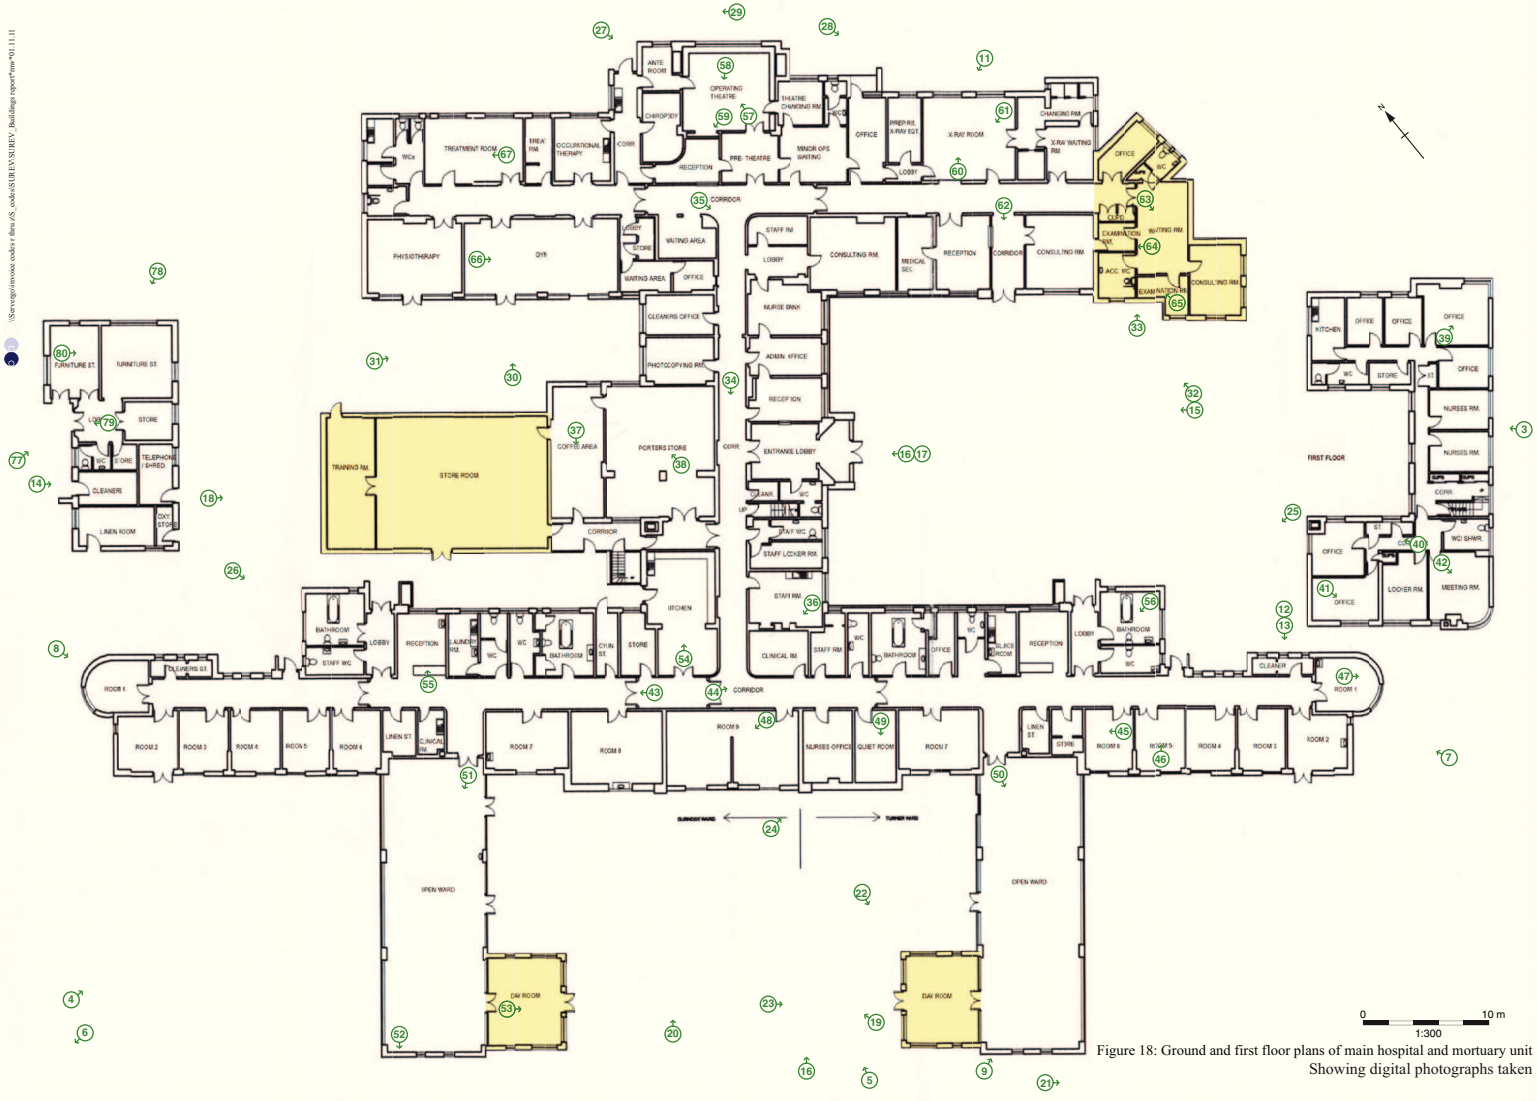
Ground and first floor plans of main hospital and mortuary unit
